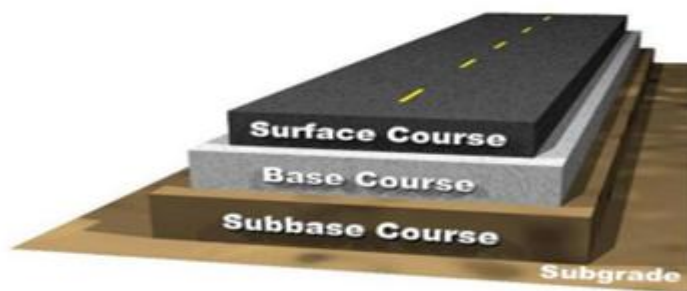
Cross-section of flexible pavement system (after Muench, 2006)
